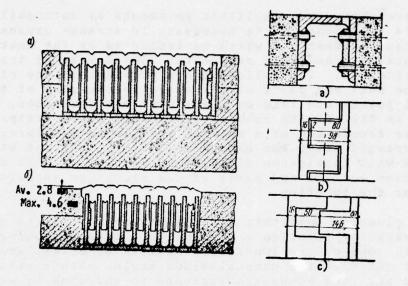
Filling the junctions of the widening of prestressed prefabricated-monolith pavements with rubber, reinforced steel strips: a-design of the junction; b-junction after temperature compression deformation.
